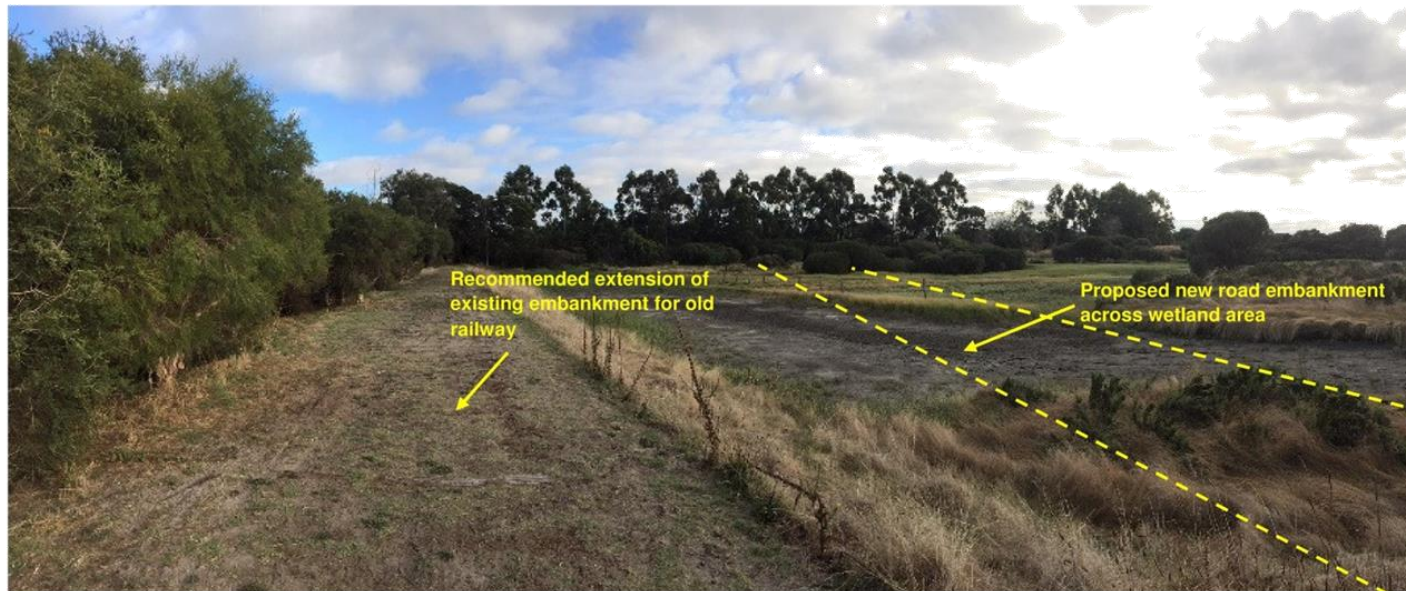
Causeway Road-Camilleri Street alignment – use of existing railway corridor would reduce impacts
